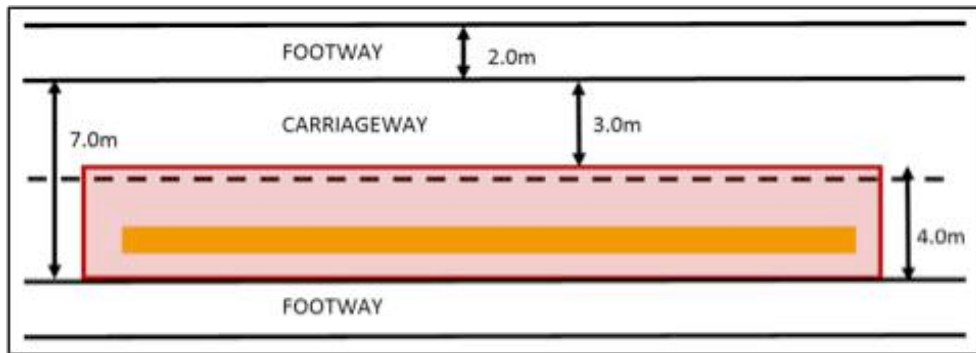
CONSTRUCTION ZONE ON CARRIAGEWAY
